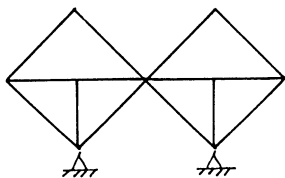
A truss that cannot retain its shape is called a compound truss.
